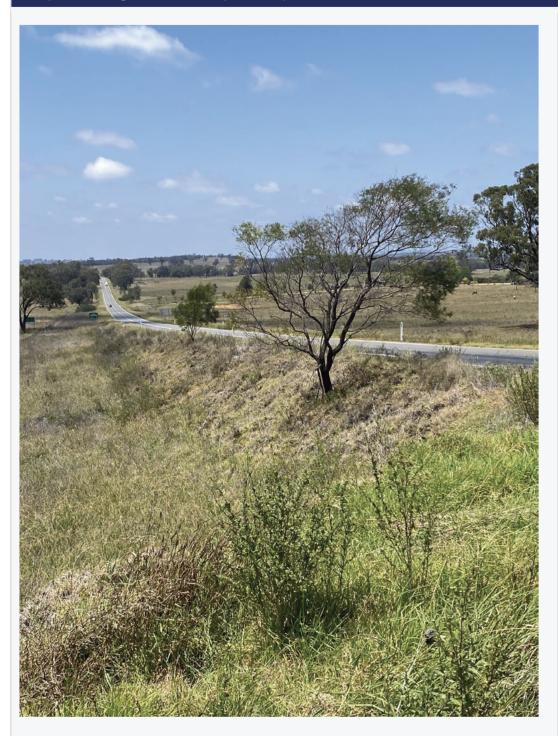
Site photograph of impacted tree - Golden Highway and Vinegaroy Road intersection (I-010)
